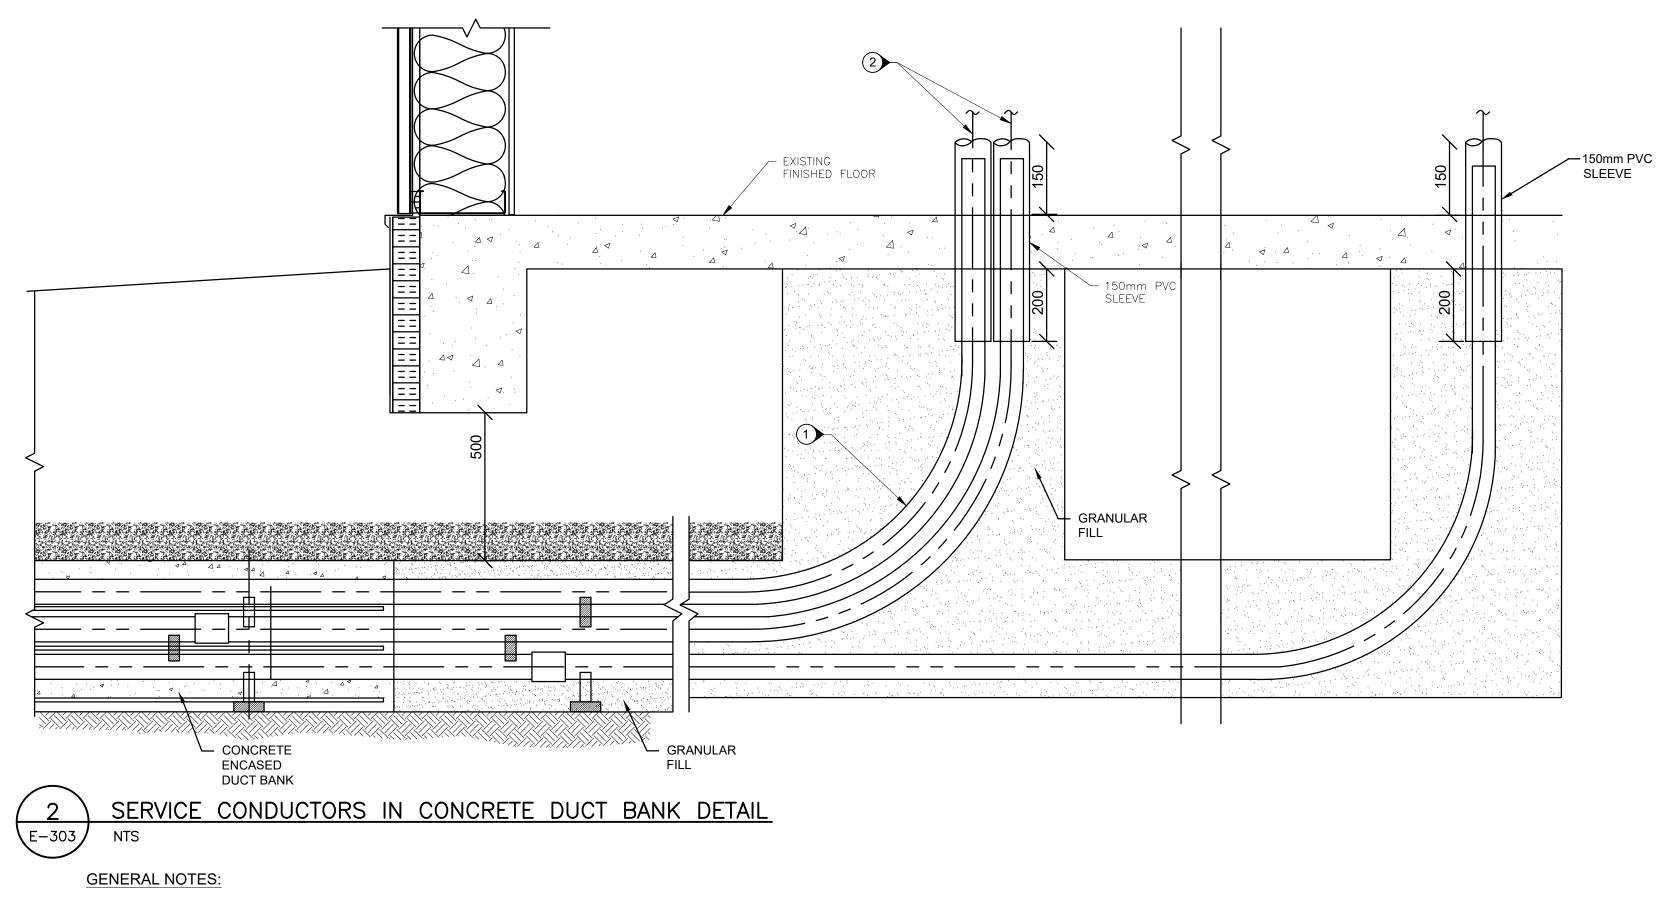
TYPICAL CONCRETE DUCT BANK SECTION VIEW
